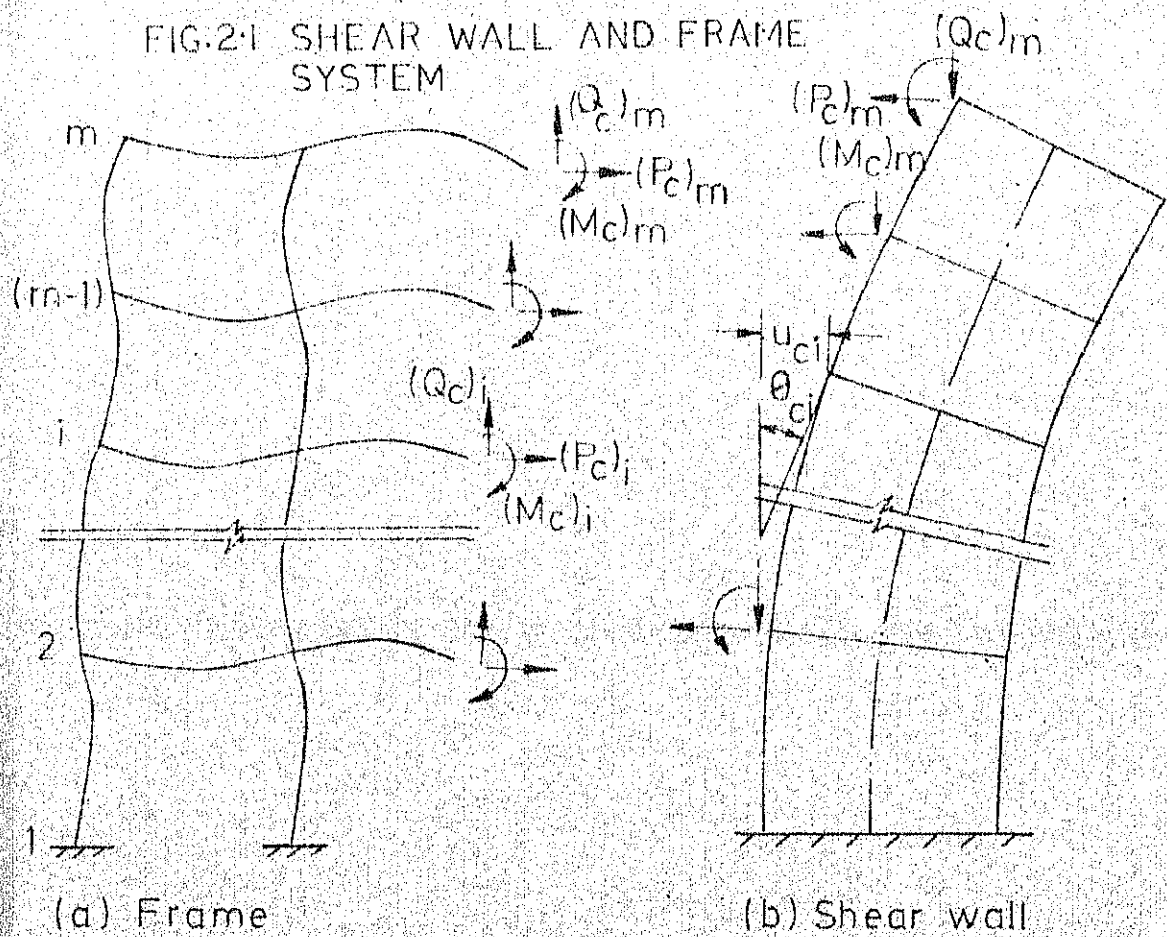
SHEAR WALL AND FRAME SYSTEM
